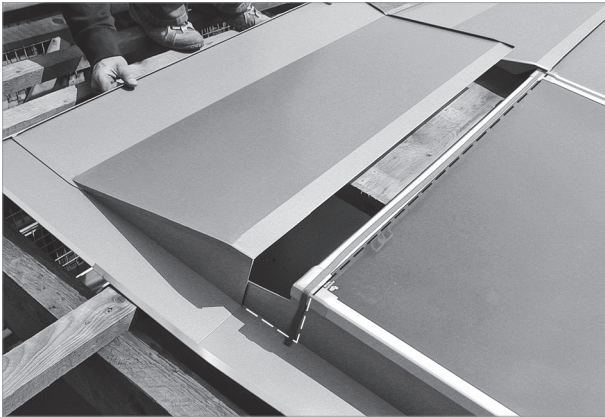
Placing the top flashing on the side flashing and pressing it against the collector
